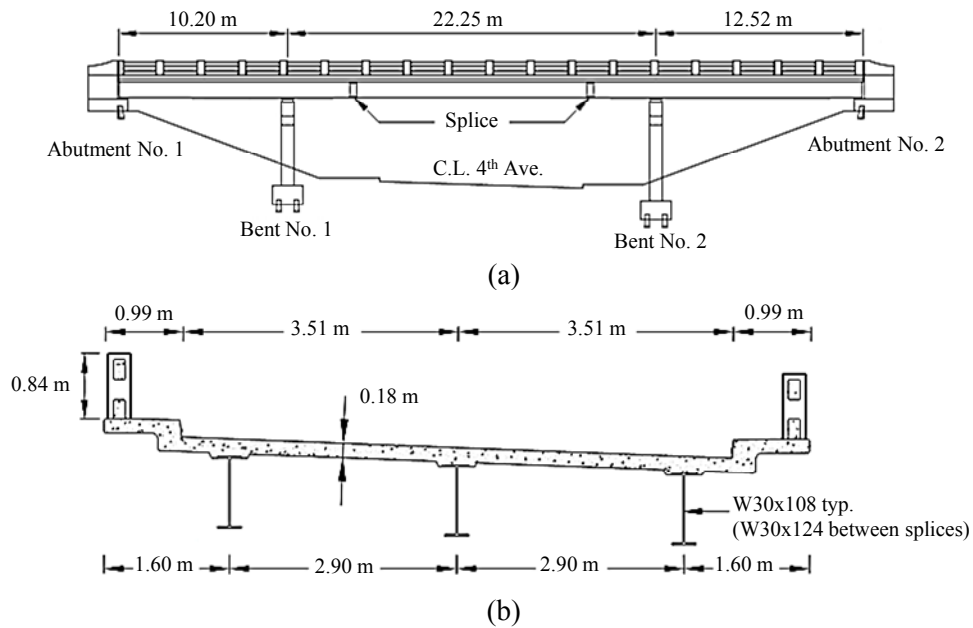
Entrance ramp to James White Parkway from I-40 westbound (a) Longitudinal profile (b) Cross-section (modified from Ragland 2009)
